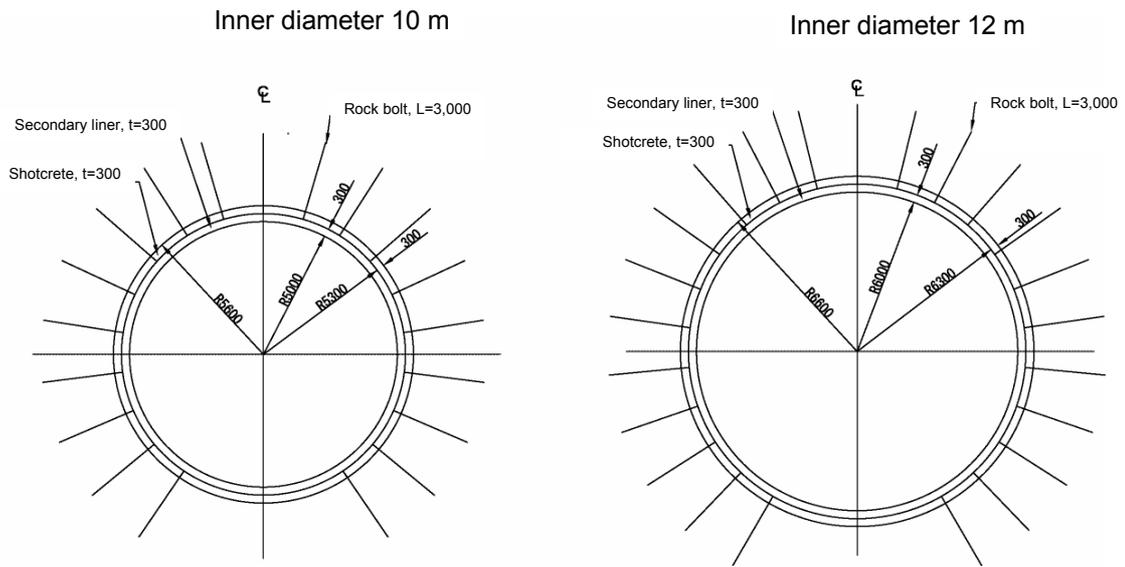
Cross-section of a circular disposal tunnel in soft rock
